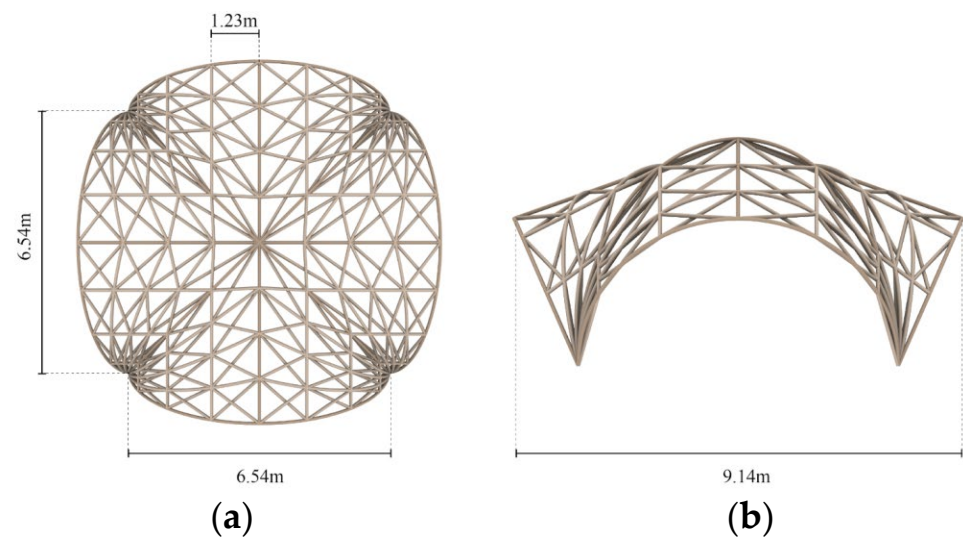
Plan (a) and elevation (b) view of Iteration Two.
